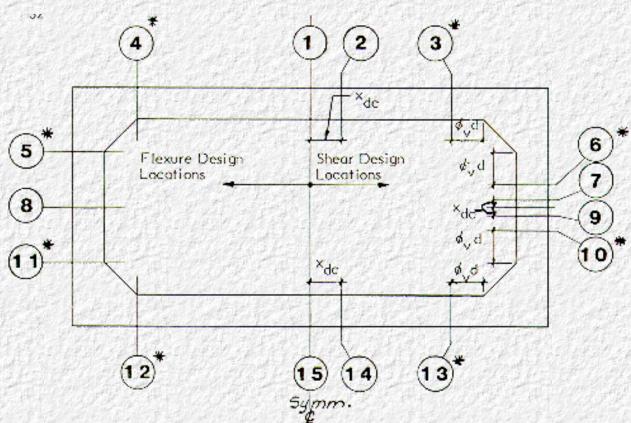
Typical Reinforcing Layout for Single Cell Box Culverts
